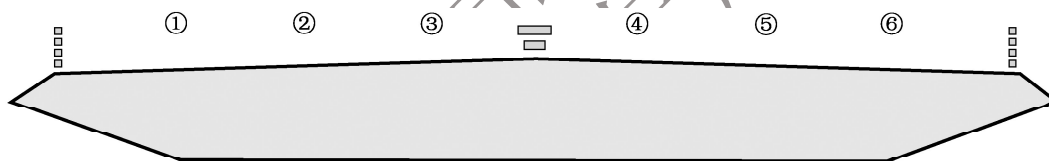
Schematic for positions to extract the wind speed profile on the deck of the north navigation channel bridge of the Hangzhou Bay Bridge
